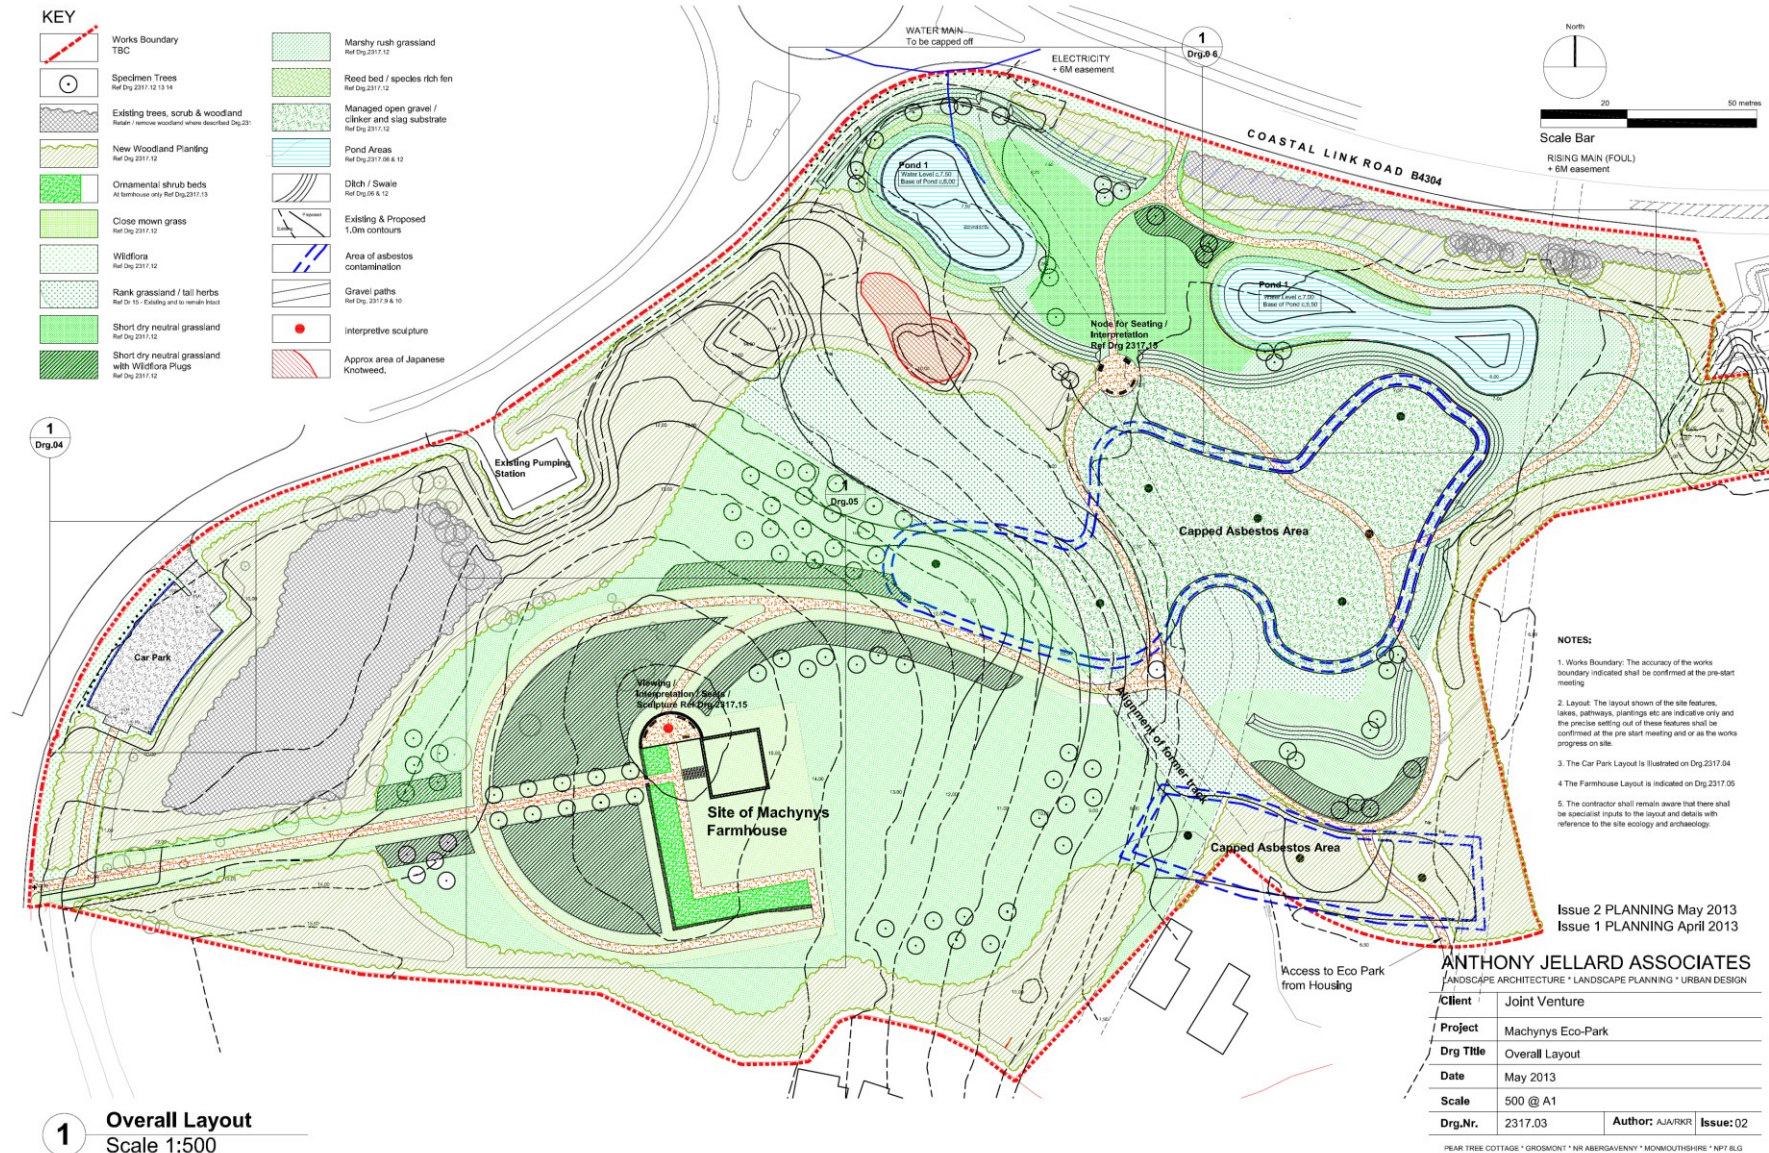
Detailed map of the layout of the proposed Eco-Park, showing proposed landscape profile, planting, pathways, car park and site of Machynys House provided by ARUP on behalf of the client
